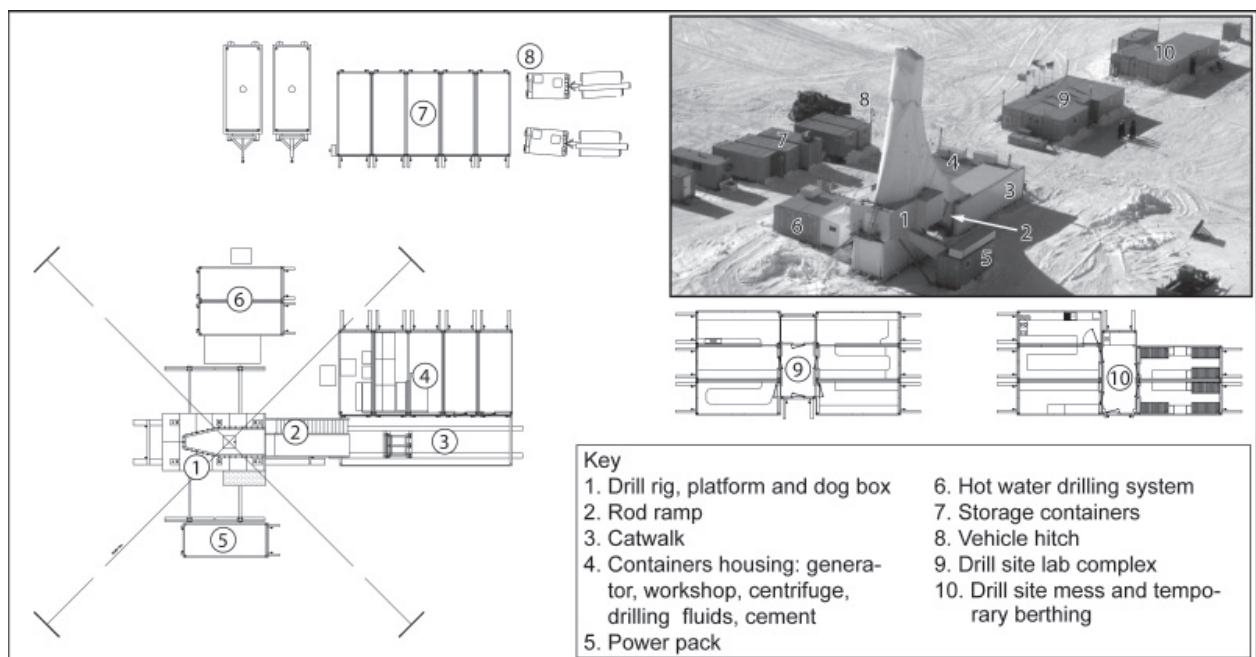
Plan of the MIS Project Drill Site layout. Inset: aerial photograph of the drill site.
